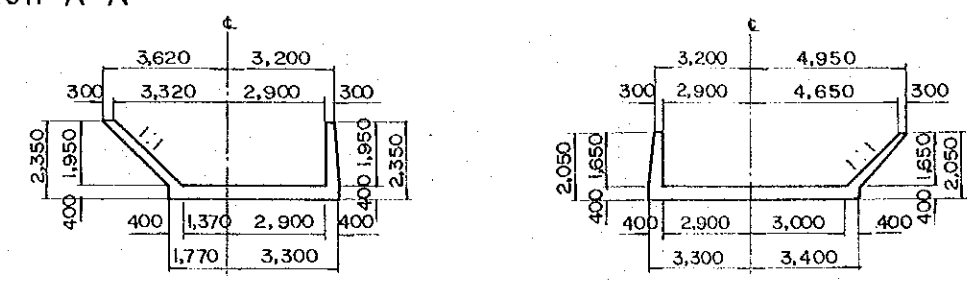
,(7) Plan of Intake and Settling Basin
